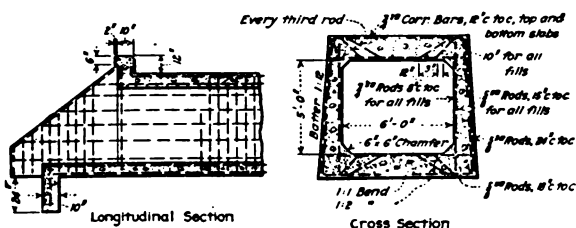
Standard culvert of 6-ft. span, Hampden R. R.
